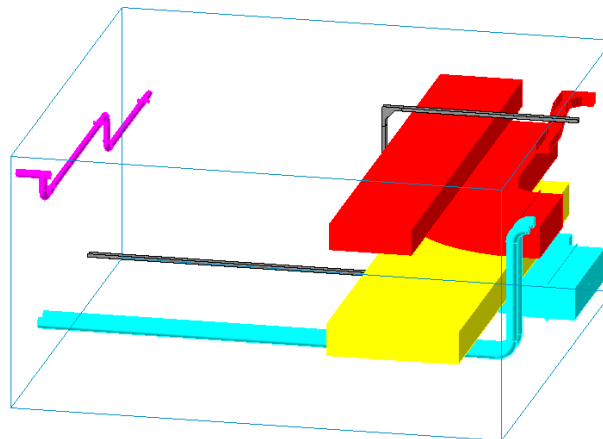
Electrical and Mechanical Piping and Baggage System Clearance Inspection
